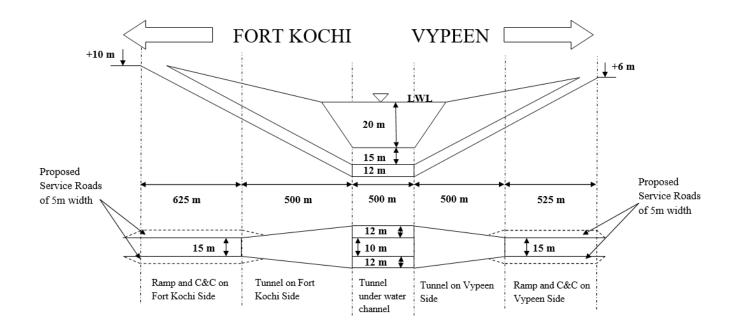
Longitudinal Profile and Plan of Proposed Tunnel (Skematic- Not To Scale)
